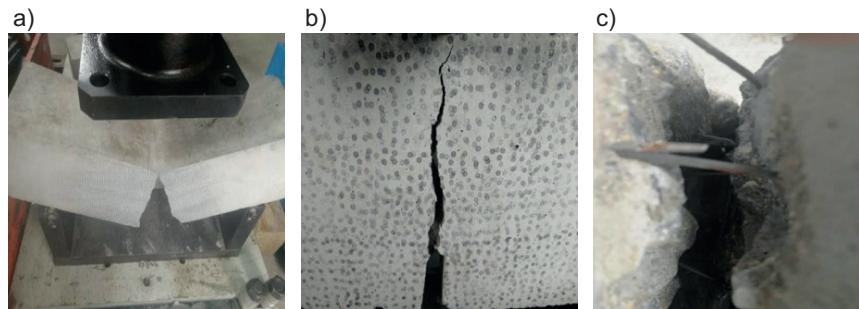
Fracture phenomenon of TPB beam specimens, a) The fracture of plain concrete; b) The fracture of ordinary steel fiber-reinforced concrete; c) The detail view of fracture of recycled steel fiber-reinforced concrete.
